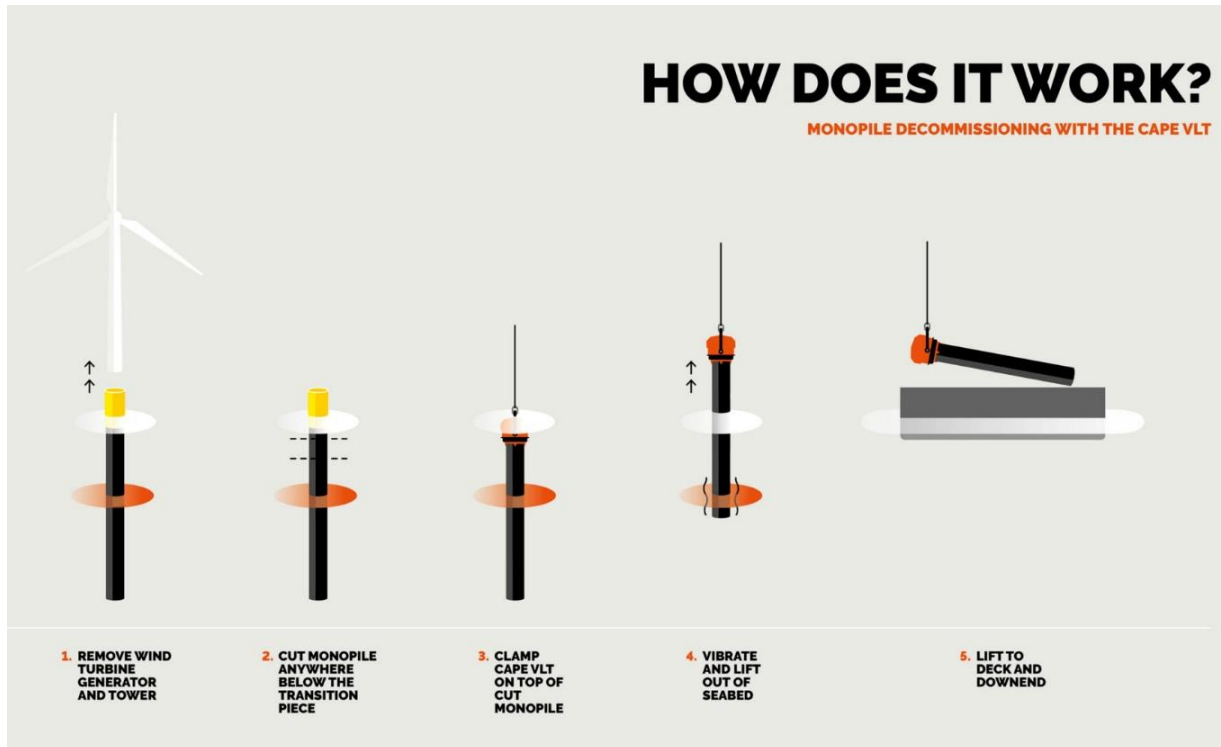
Full monopile removal process using vibratory technology (source: CAPE Holland).
